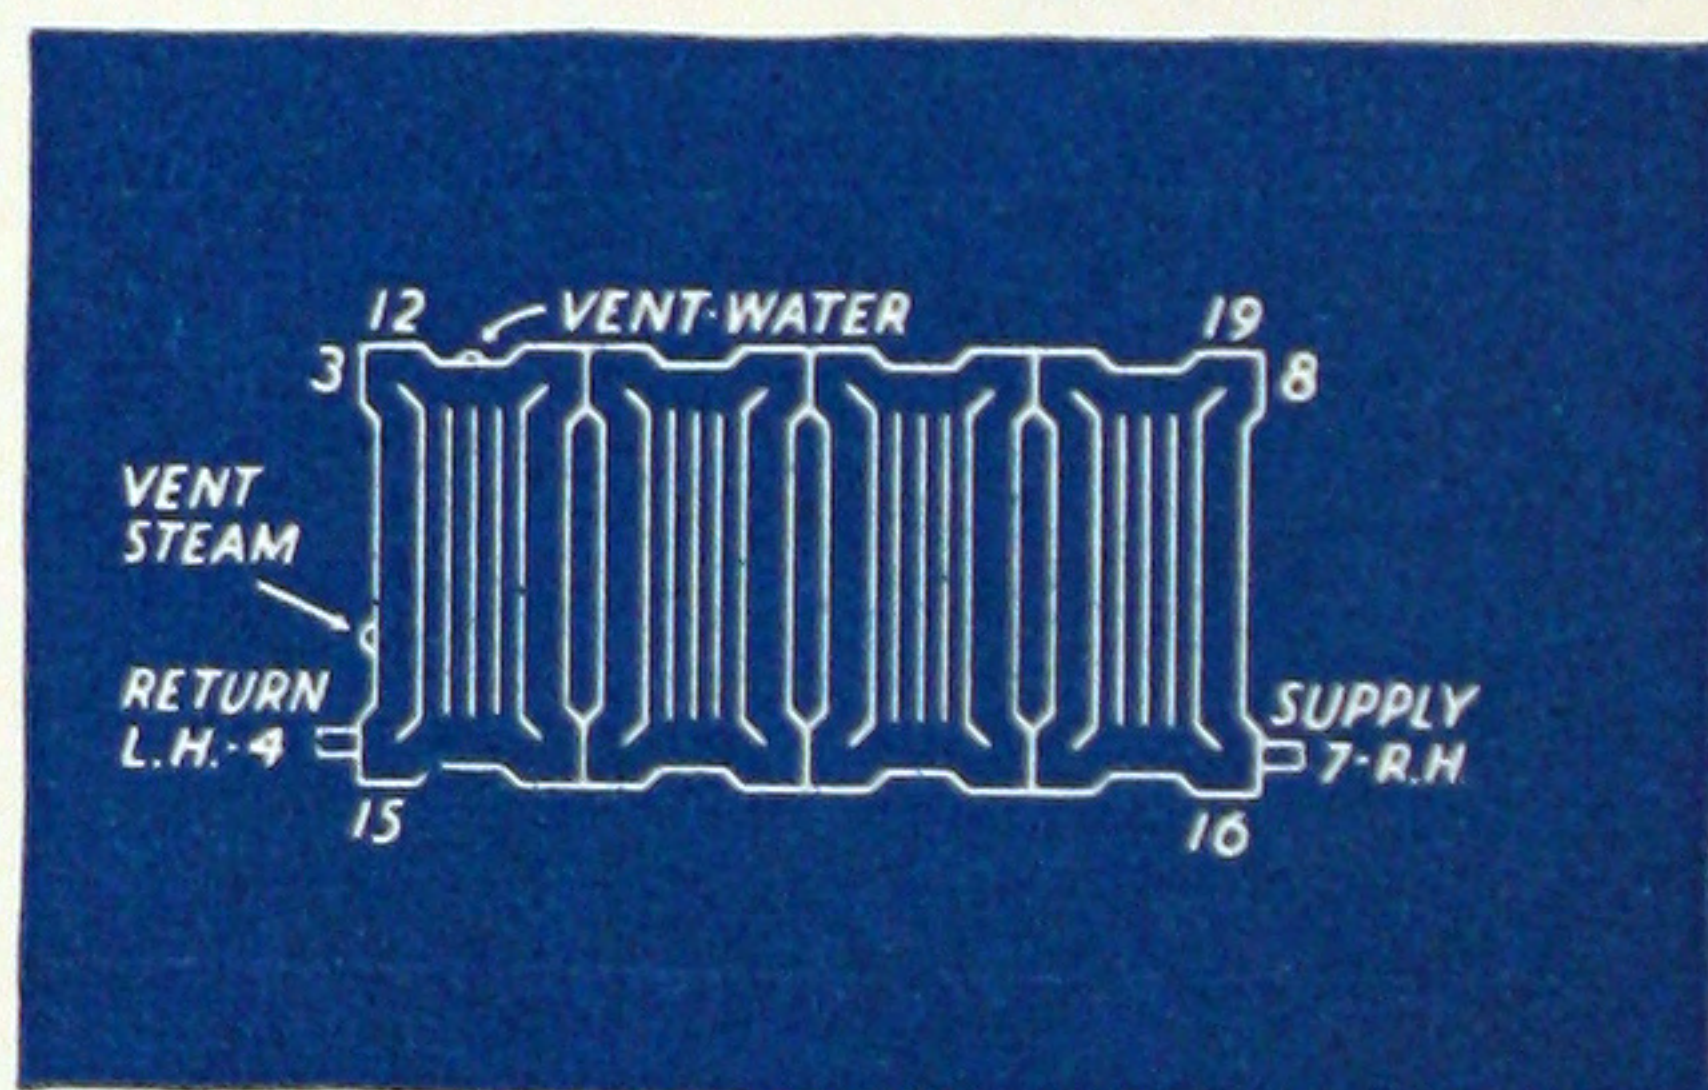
Assembled in single tier. For water or one and two pipe steam.
